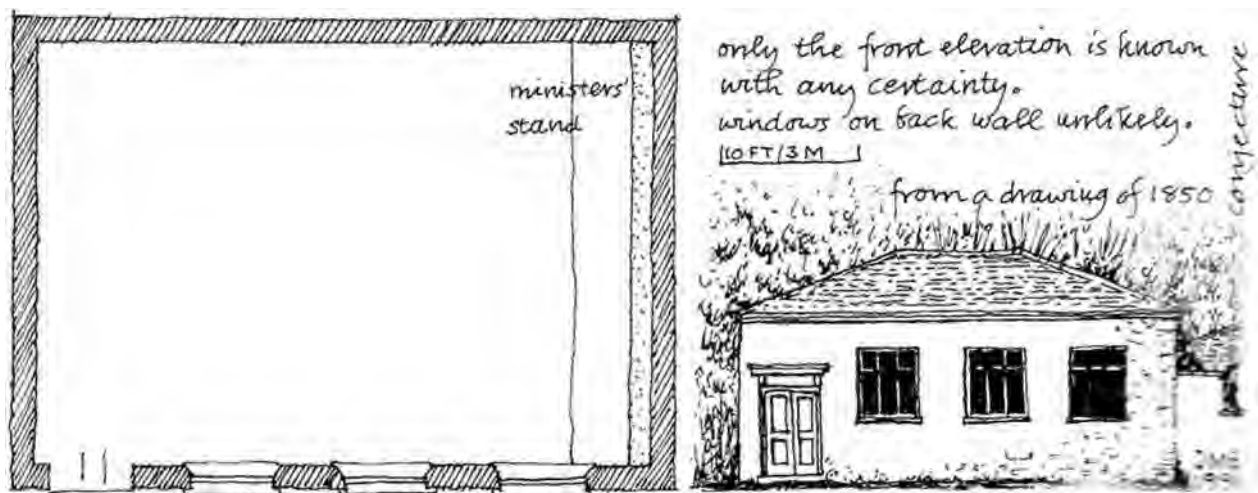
Plan of Coalbrookdale Friends Meeting House, c.1860.<sup>8</sup>
